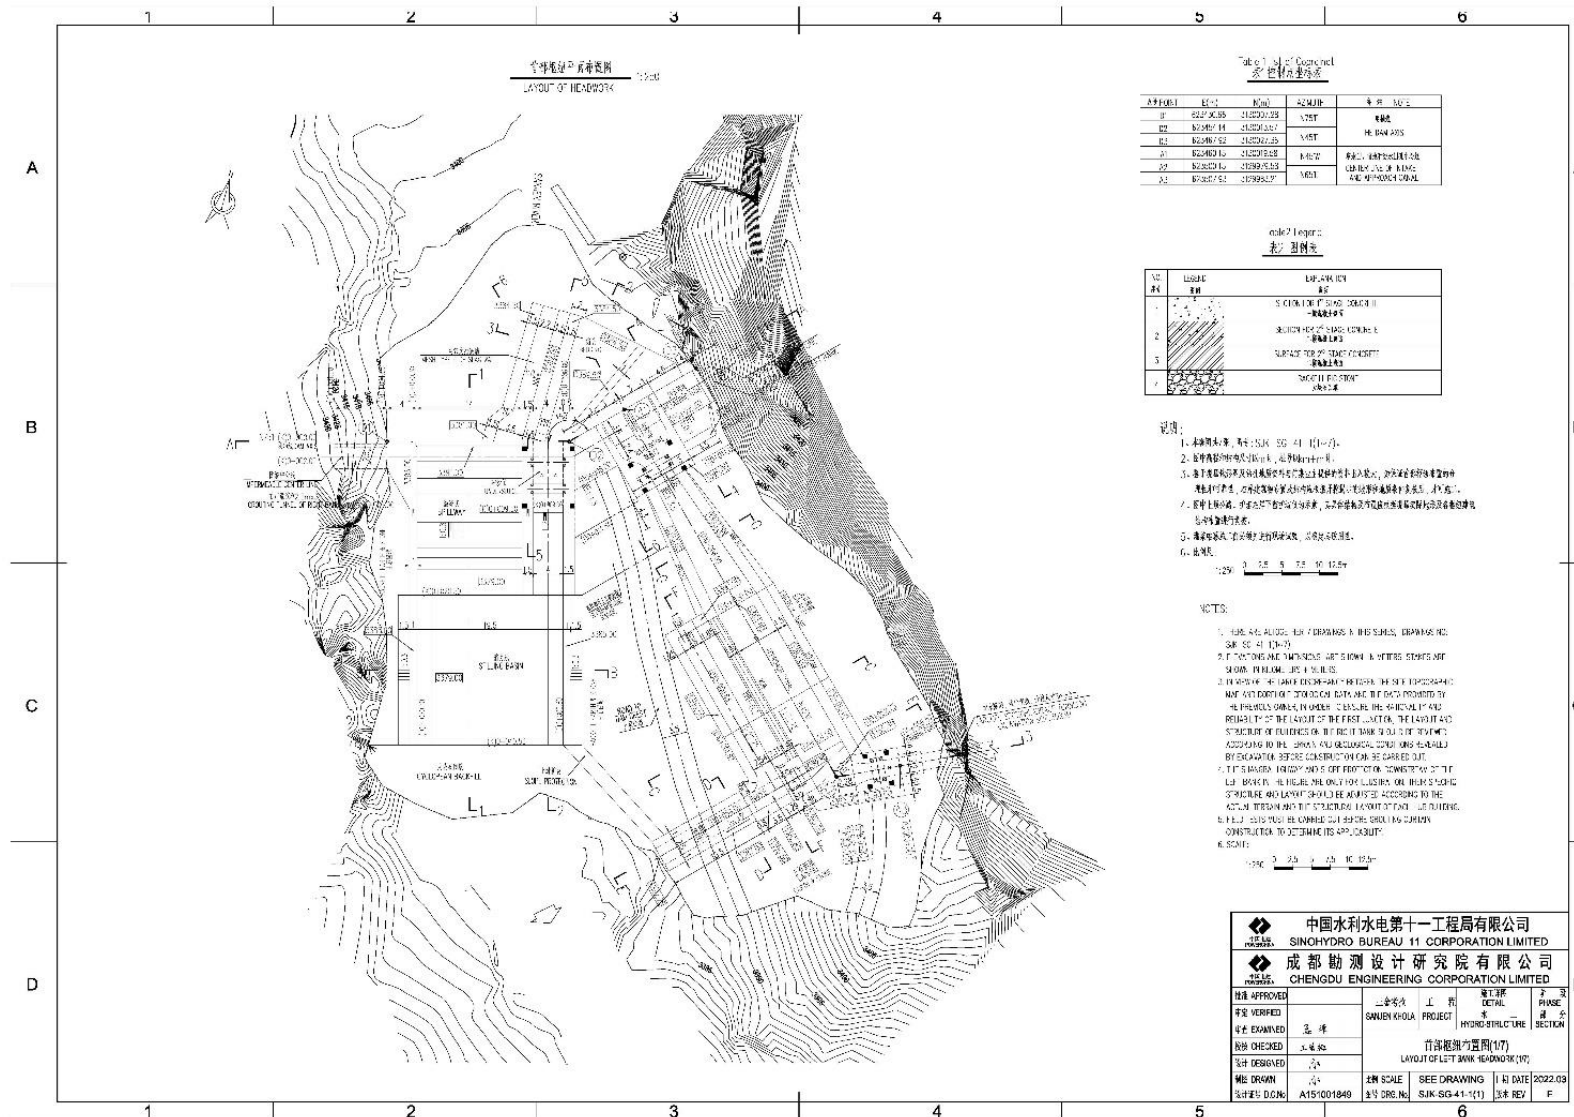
Plan of the Headworks Area (Source: Detail Design Report 2021)
